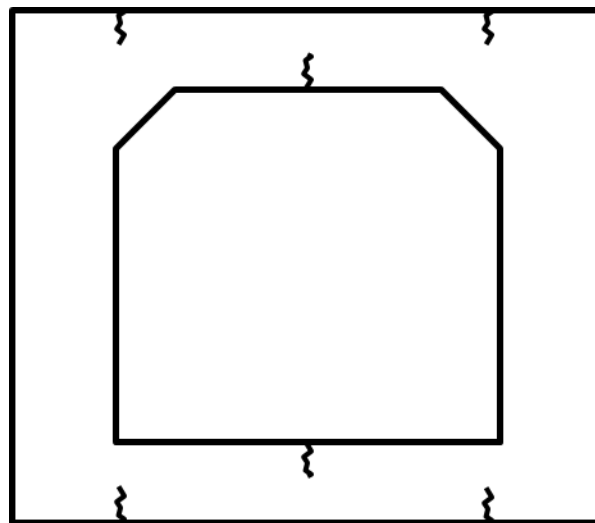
Expected Locations of Longitudinal Cracks in Box Culverts
